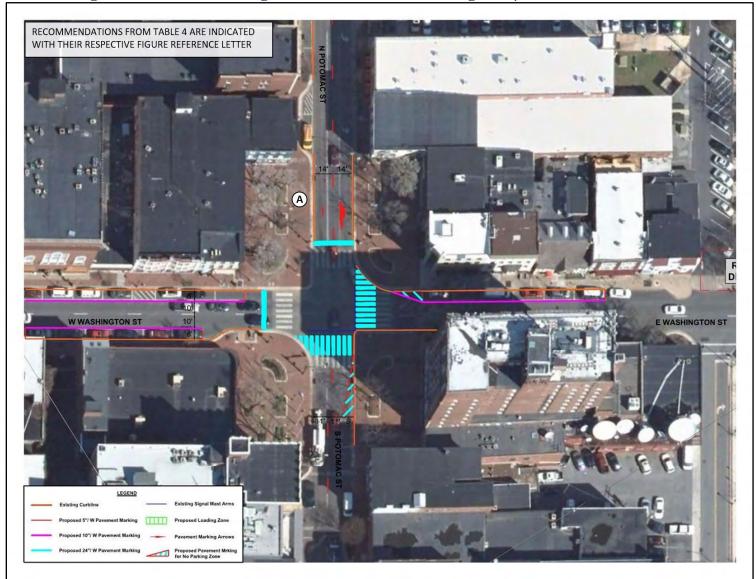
Pavement Marking Recommendations at Washington St/Potomac St Intersection
